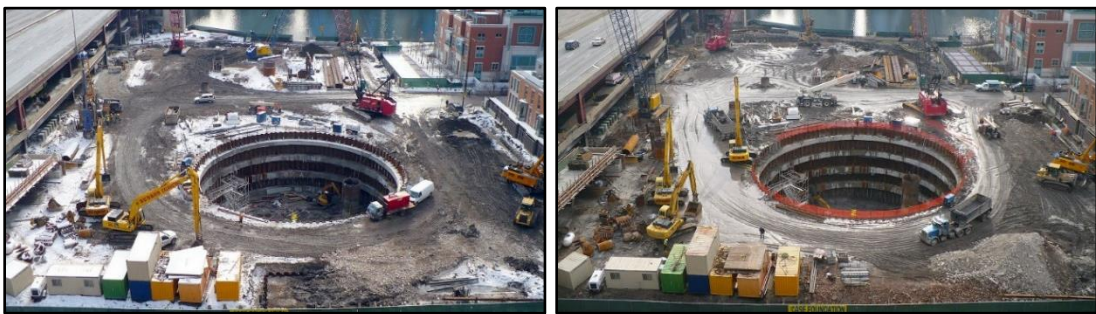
Castings concrete RB 2 and third excavation (from -2.857 to -6.333 CCD)
